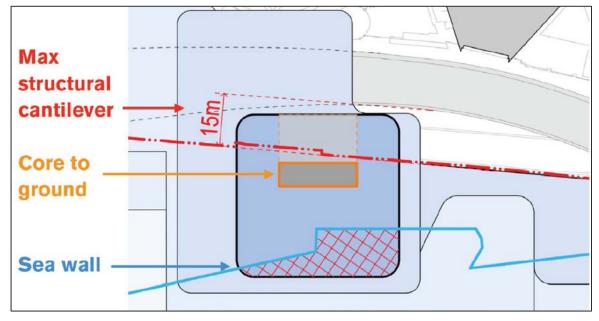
| Structural complexities related to construction of a tower in a southern location (Source: Applicant's RtS)
